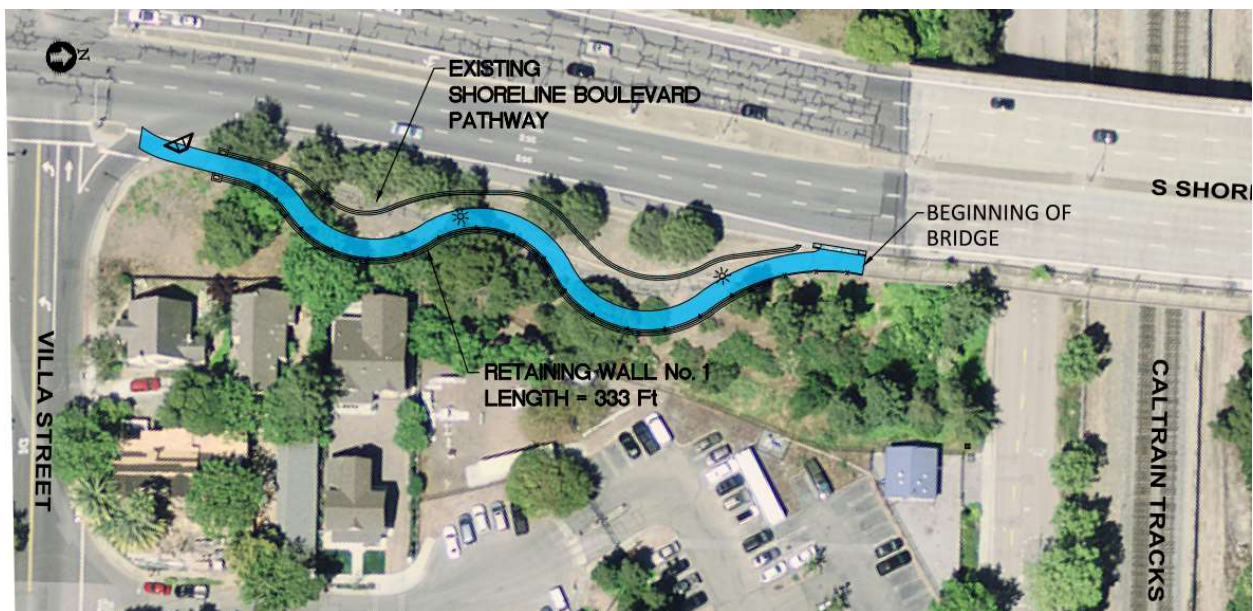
Villa Street to Shoreline Boulevard Overpass Structure
